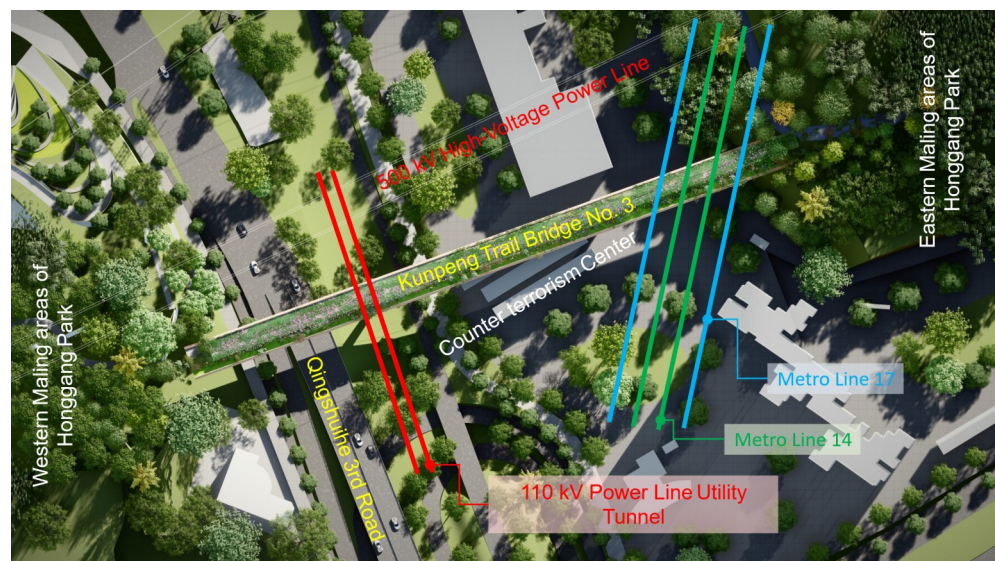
Design constraints of Kunpeng Trail Bridge No. 3
